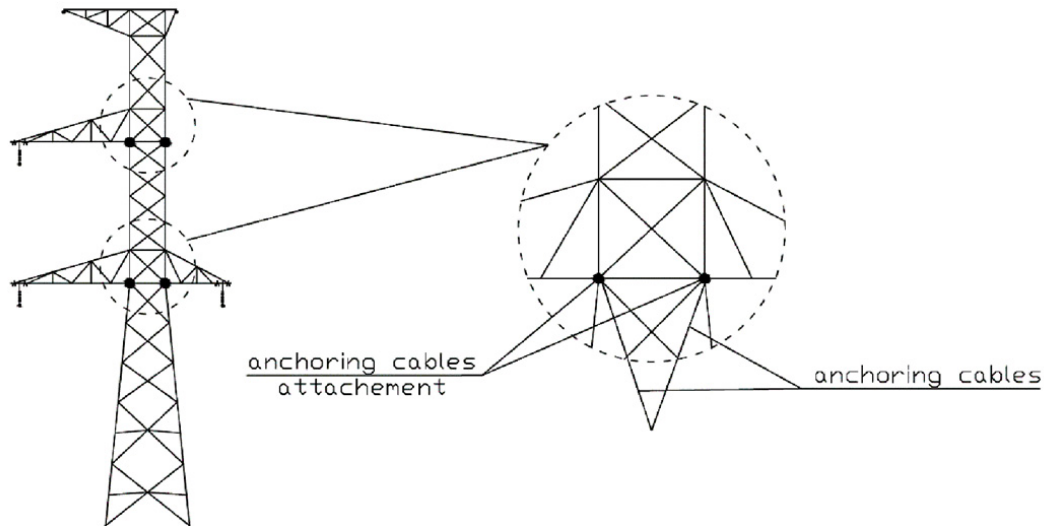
Position of points at which anchoring cables are mounted to the tower
